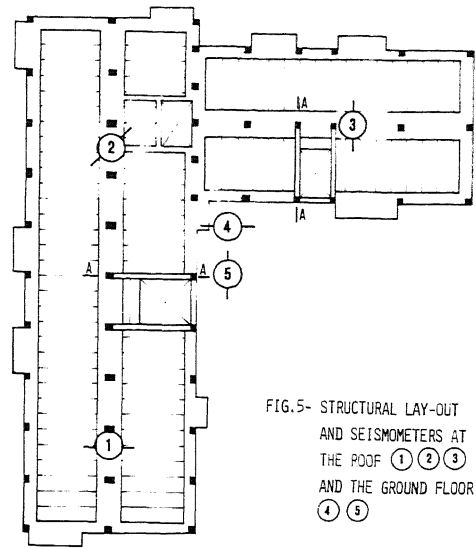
STRUCTURAL LAY-OUT AND SEISMOMETERS AT THE ROOF ① ② ③ AND THE GROUND FLOOR ④ ⑤
